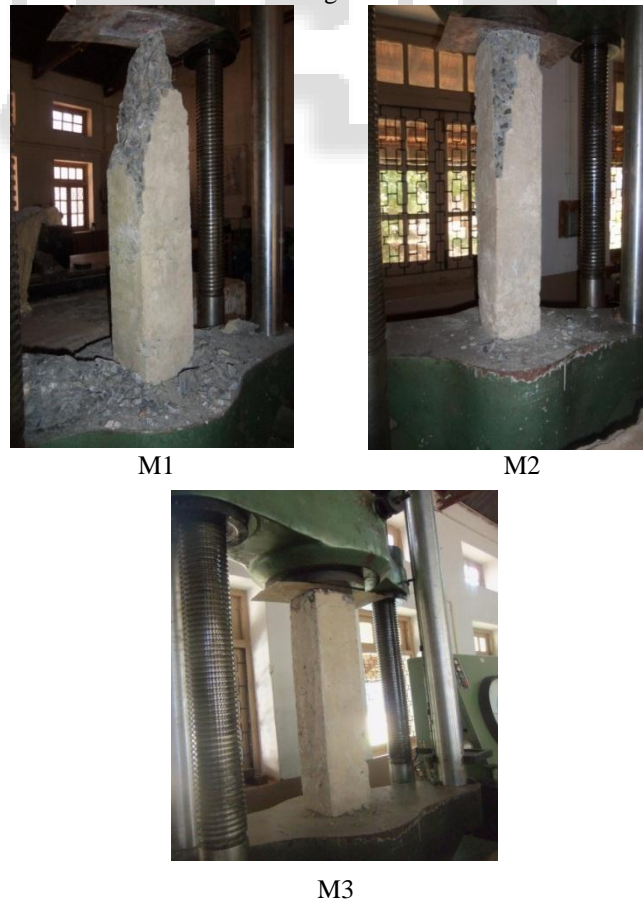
Failure Pattern of Unconfined Different Grades of Concrete Columns
